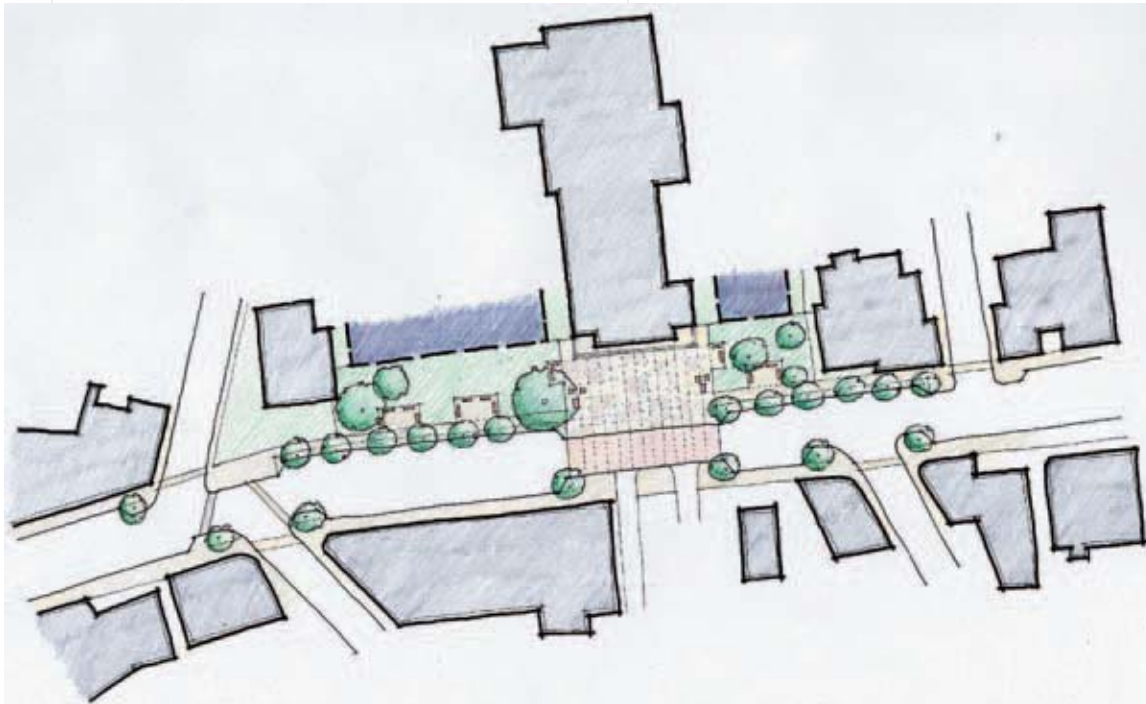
Plan of Proposed Blessed Sacrament Church Plaza
